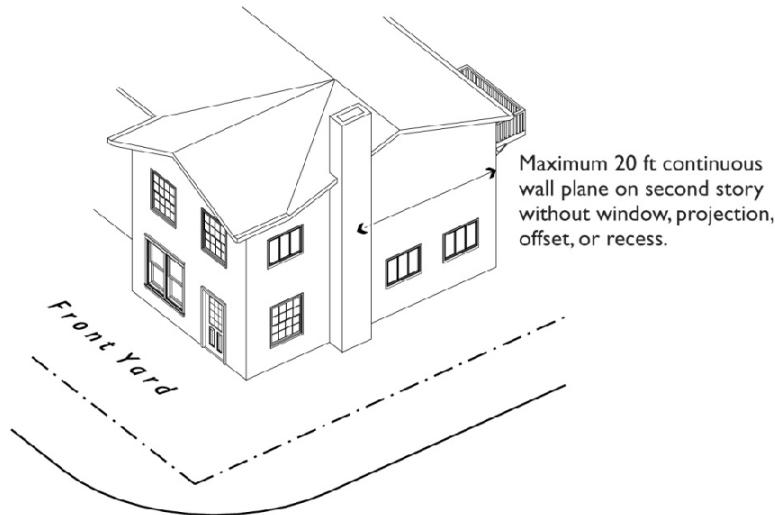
B(1): TWO-STORY DWELLINGS ON CORNER LOT
